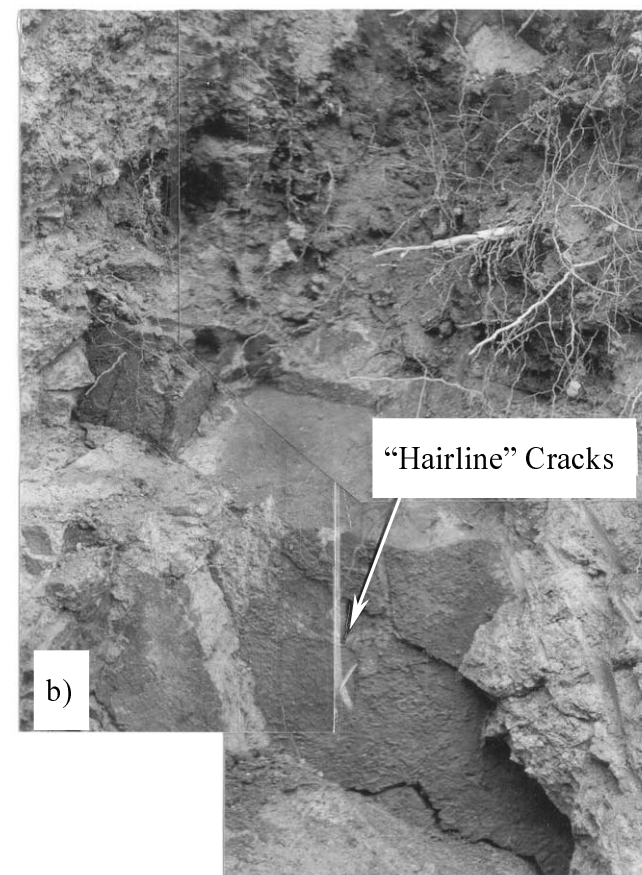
Open Joints and “Hairline” Cracks Observed in the Tuff in Trial Trench TT6 and Trial Pit TP7
